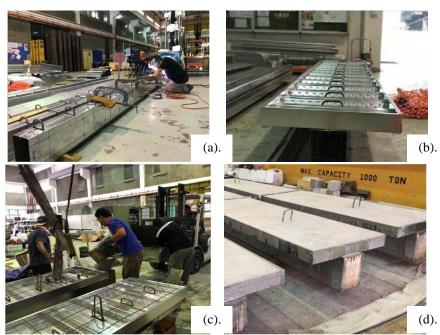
Proccessed for arragement specimens: (a) C-channel assembled box-section (b) Profile metal decking installed (c) Casting (d). Composite beam specicemen
